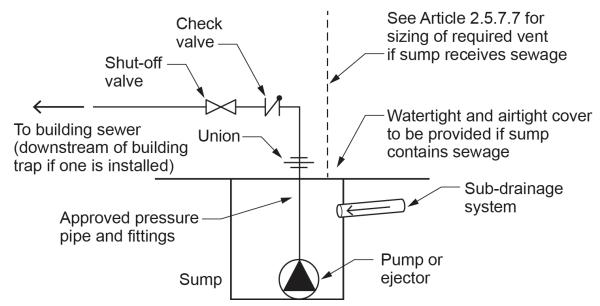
Note A-2.4.6.3 arrangement of piping at sump. (Skilled Trades BC, 2021) Used with permission.
